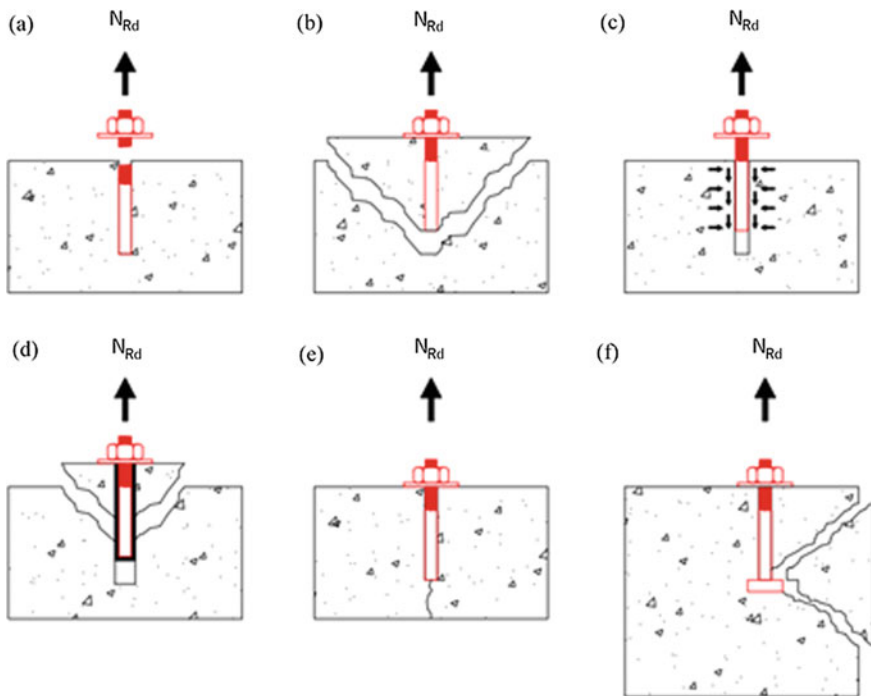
Typical failure modes of post-installed anchors under tension load: a steel failure, b concrete cone failure, c pull-out failure, d combined pull-out and concrete cone failure, e concrete splitting failure, and f concrete blow-out failure
